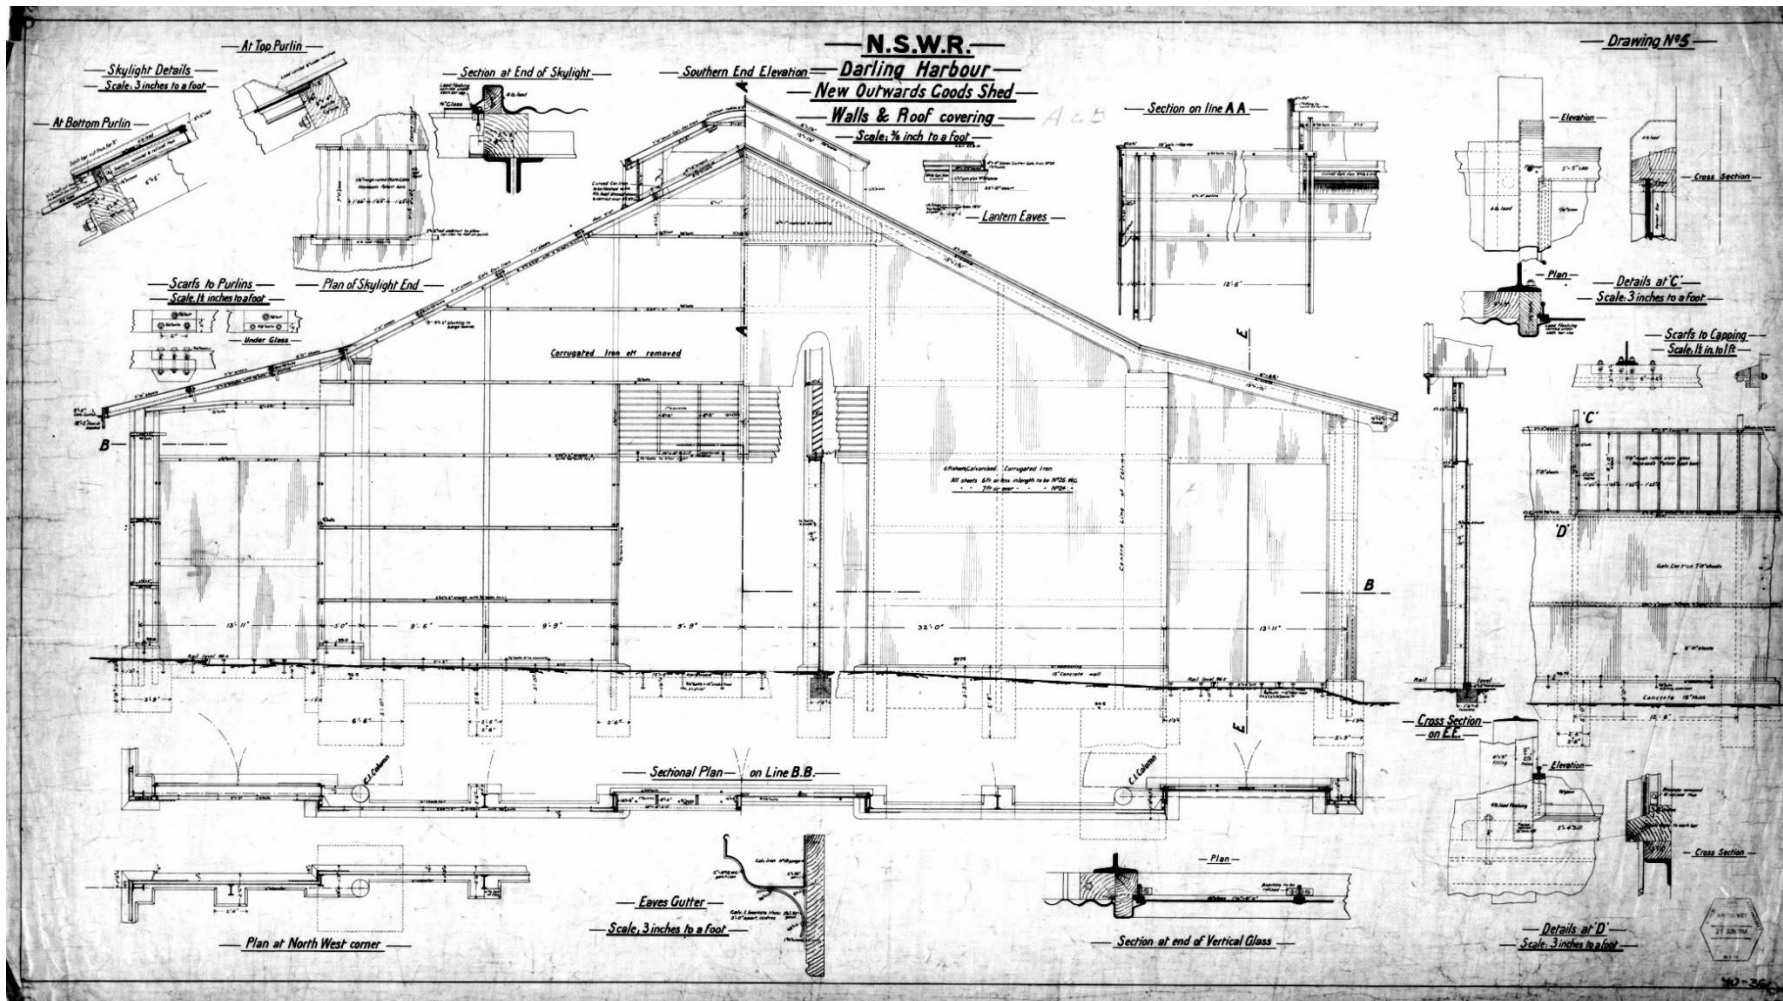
Sectional construction drawing of the Goods Shed at Darling Harbour illustrating some details of structural components of the sheds, most notably the footings for the upright supports. (Source: NSW Archives Office NRS-21554-12-24 plan 18-7131)
